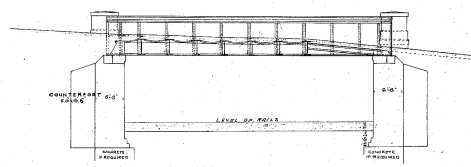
LNWR Drawings of Fieldhouse Overbridge (MVL3/98), 1882. (Network Rail NRG Archive 997707LNE).
